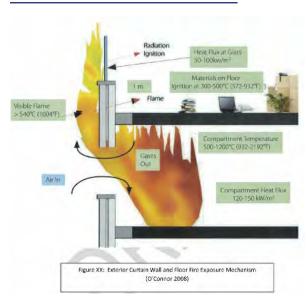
Figure XX: Exterior Curtain Wall and Floor Fire Exposure Mechanism (O'Connor 2008)
